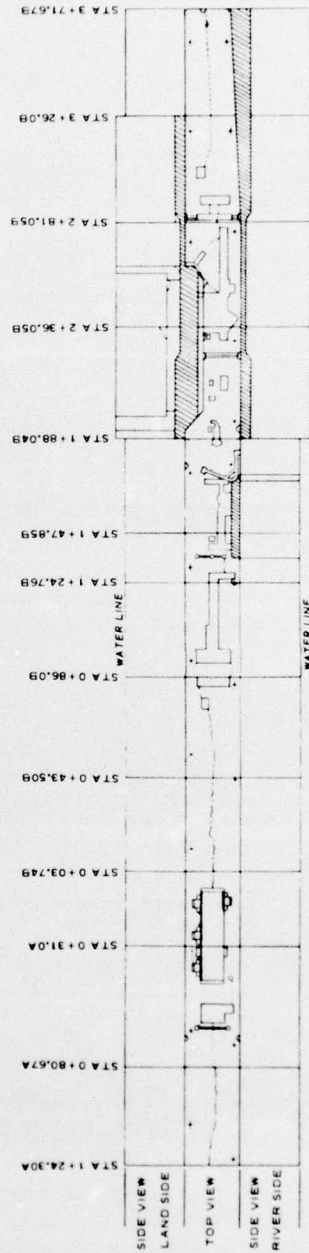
Crack survey, middle wall, Montgomery Locks and Dam, Ohio River.
